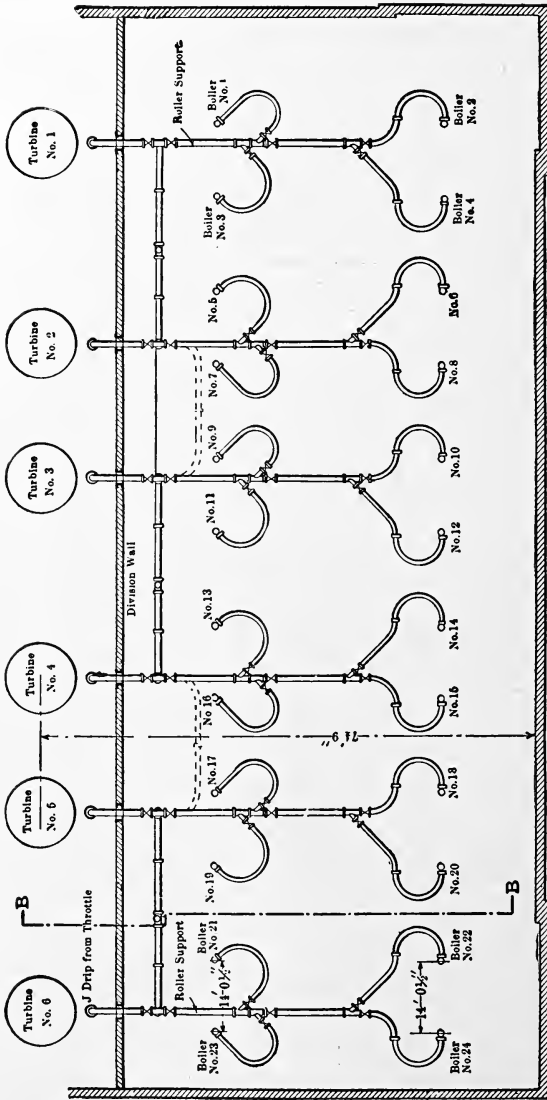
Plan of High-pressure Piping, Yonkers Power House of the New York Central R.R.
